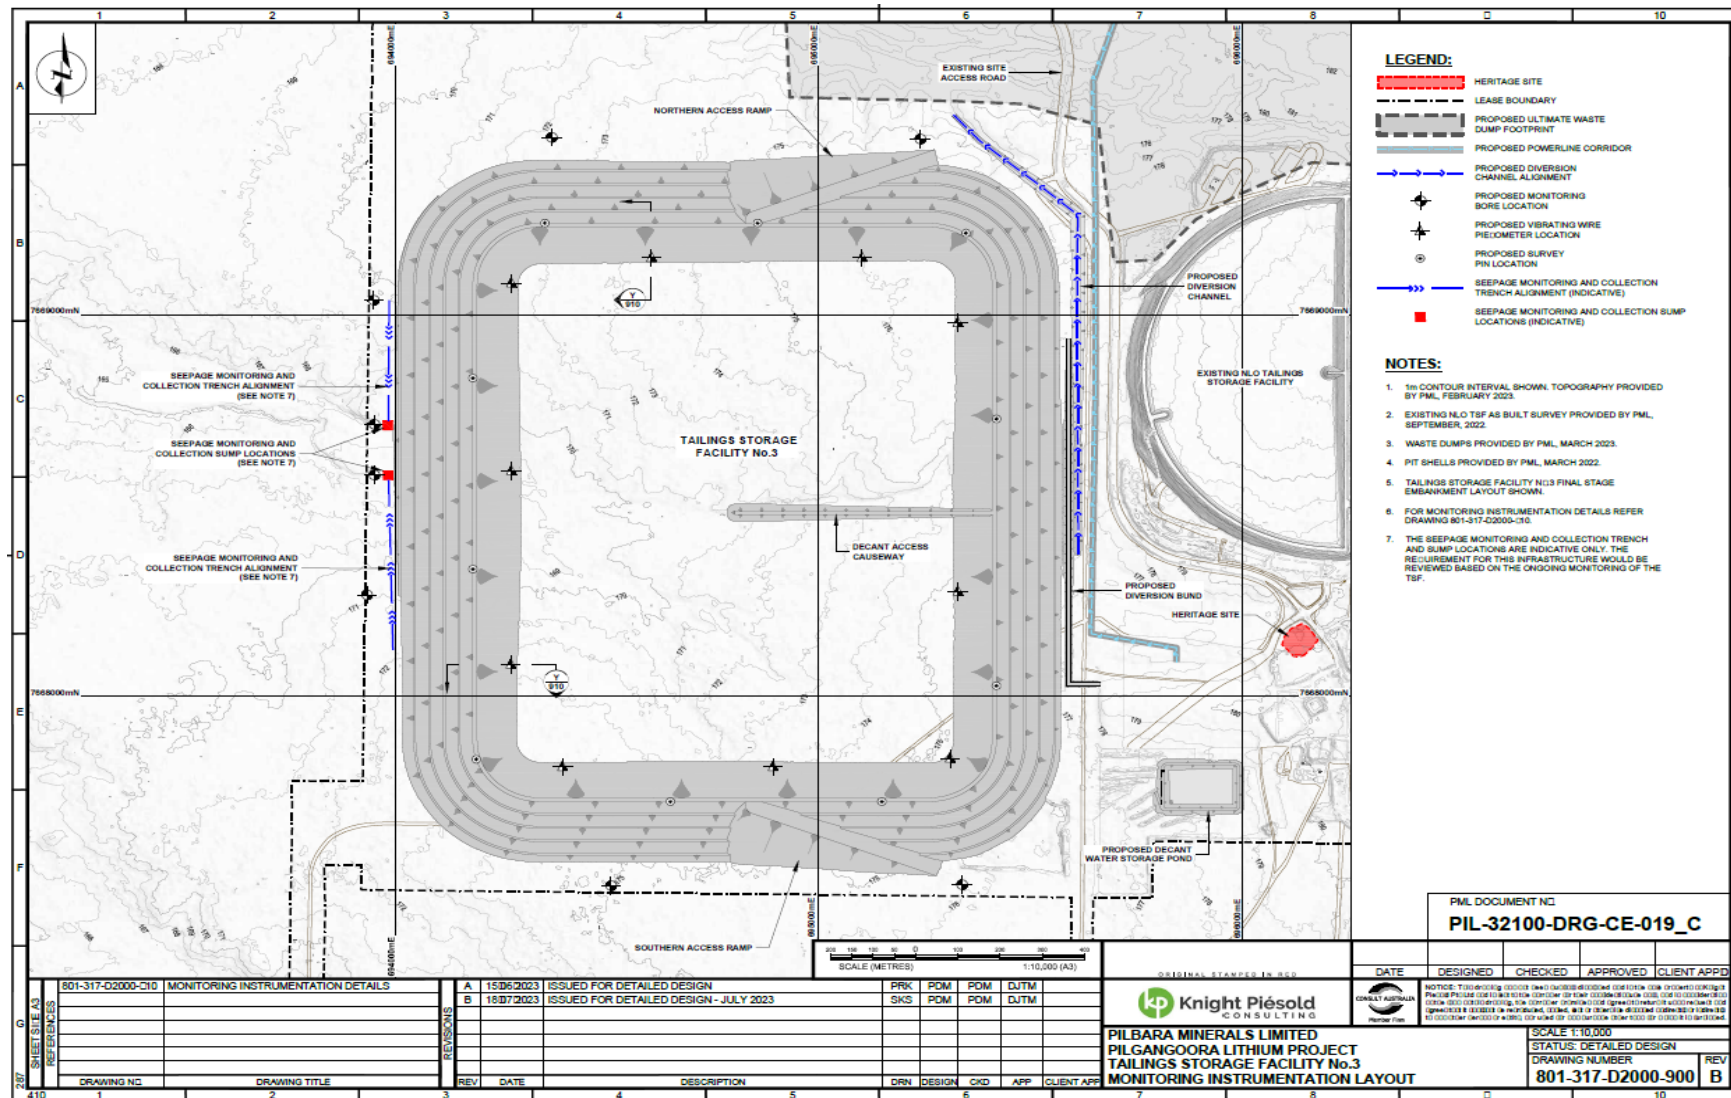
TSF3 groundwater and seepage monitoring locations and details
